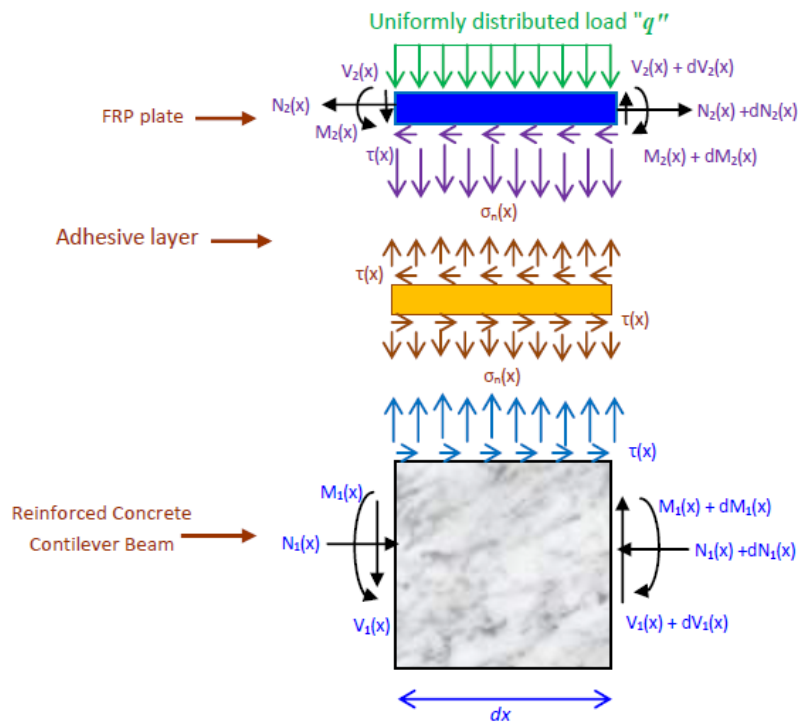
Forces in an infinitesimal element of an FRP-strengthened RC cantilever member
